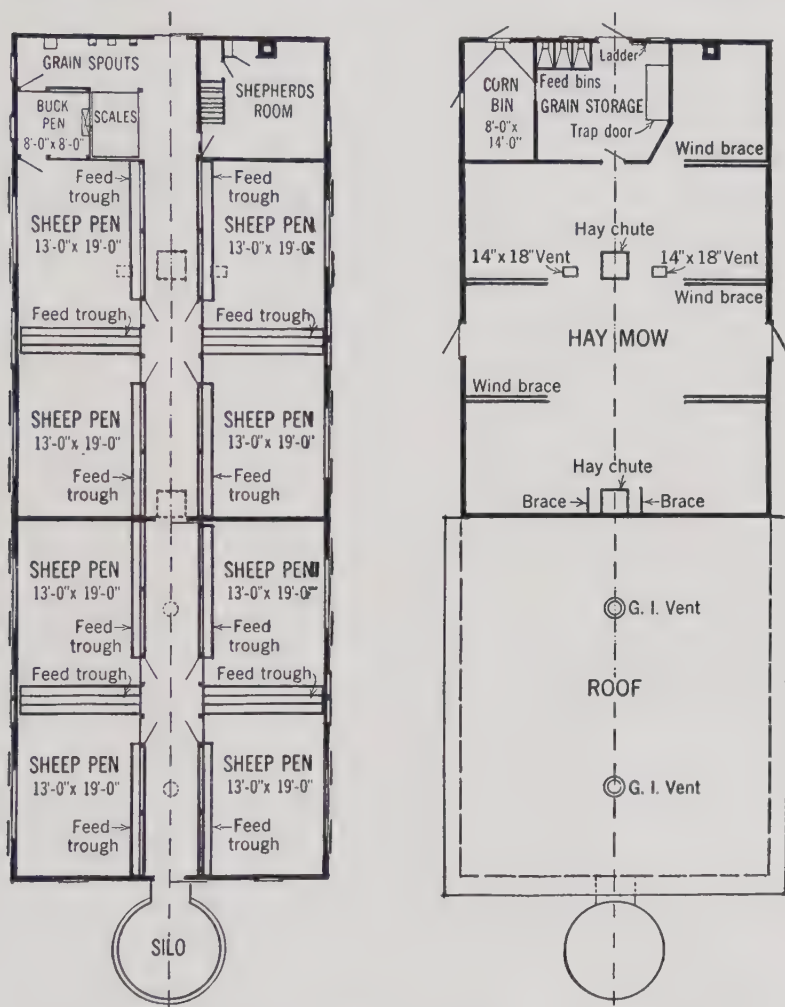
FIRST AND SECOND FLOOR PLANS OF A WELL ARRANGED FARM SHEEP BARN.
